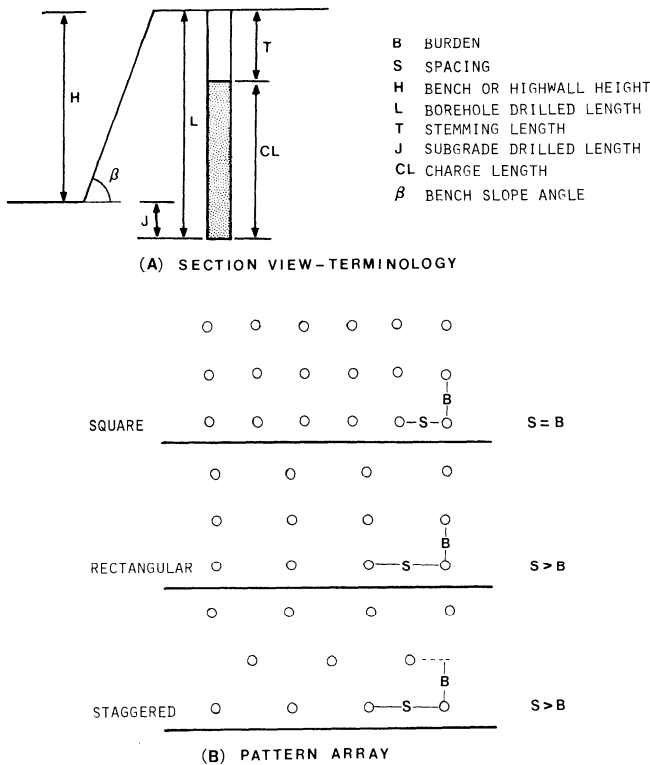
Blasthole section view (A) showing terminology used in design and (B) pattern array for layout of holes.
